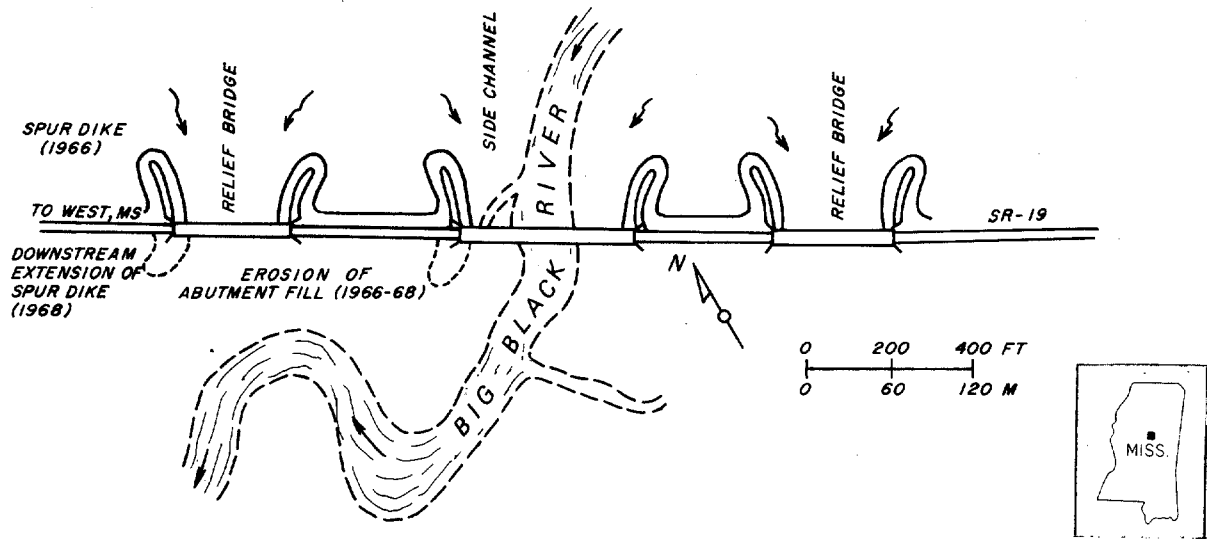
Plan sketch showing SR-19 crossing of Big Black River.
